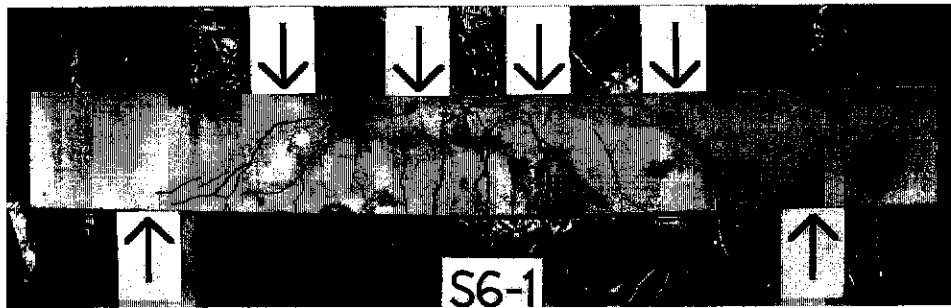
Crack Pattern of the Back Face of Beam S6-1
